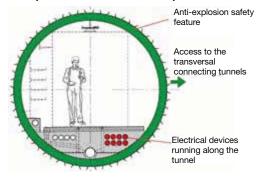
A transversal section of the Milchbuck tunnel and the extensions constructed (safety tunnel and connecting tunnels).
